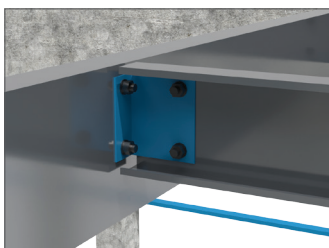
Detail of the connection of trimmer components. The joint is bolted through a TC angle piece.
